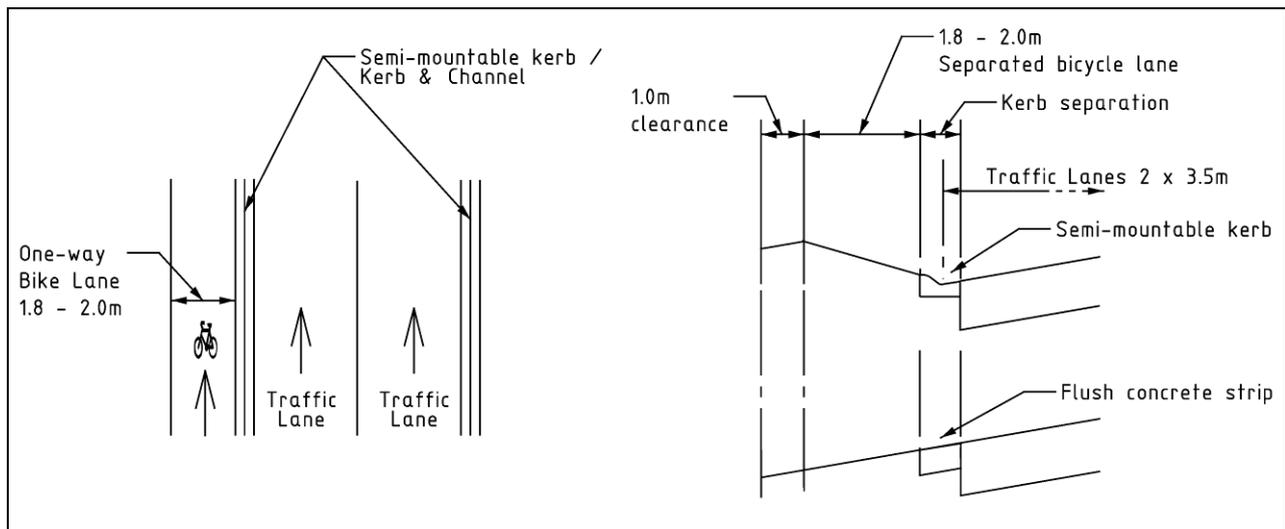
Location and typical cross-section of kerb separated bicycle lane
